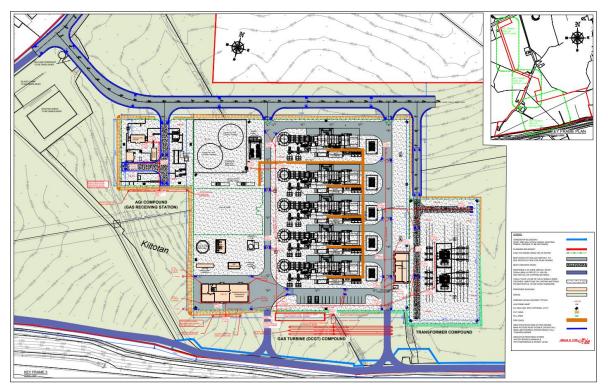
LEL Flexgen Castlelost Project Drainage Layout
